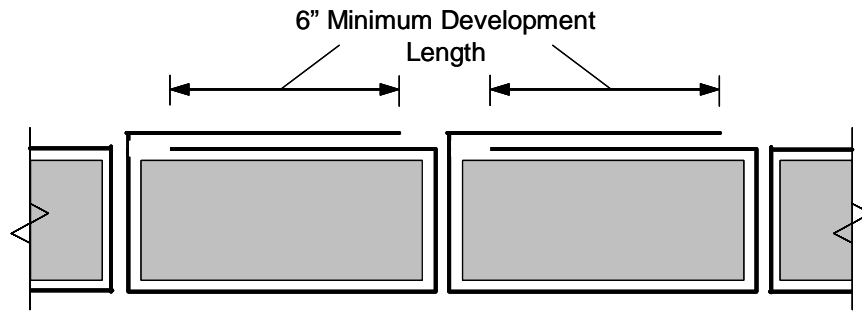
Connection Upgrade B4 CFRP Shear Stirrup Detail
